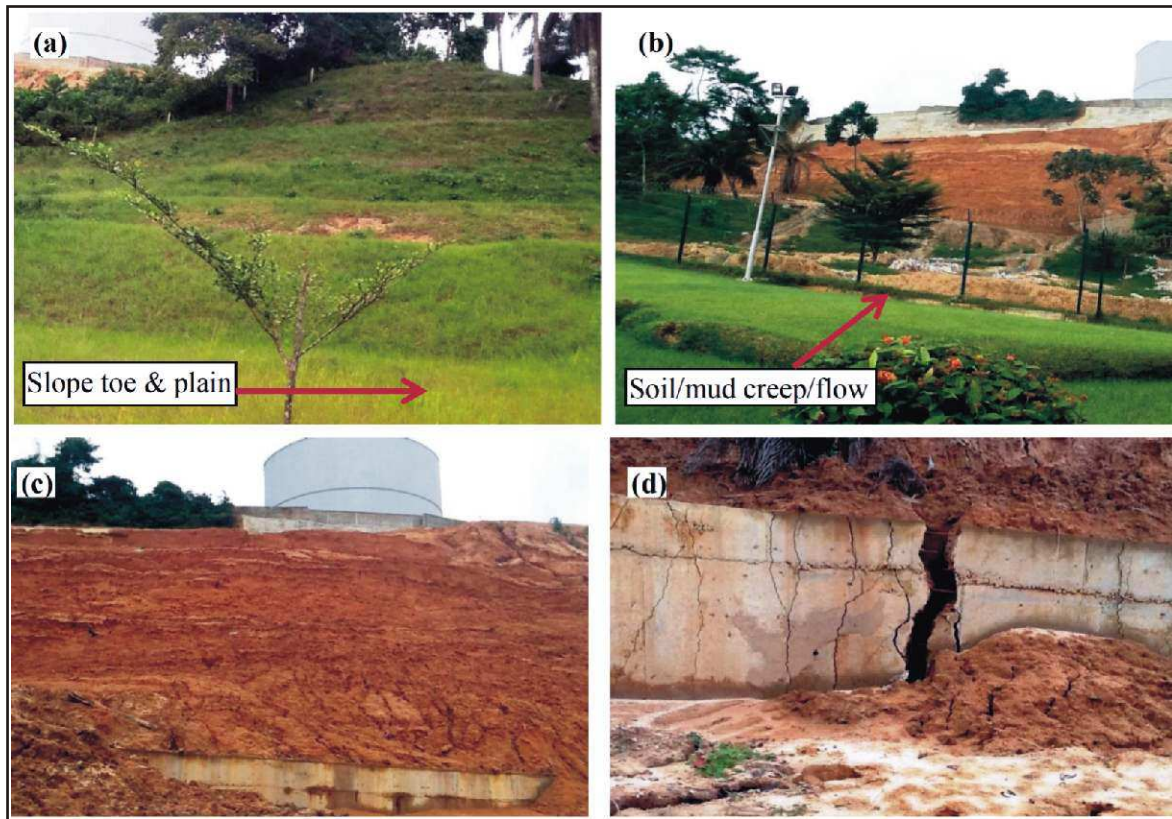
Photographs showing (a) Stable natural and semi landscape river bank slope, (b) Failed section of the natural slope caused by excavation, grading and filling operations during construction of the access road, (c) section of the concrete retaining wall covered by soil slumping from upper slope section, (d) severely cracked and failed retaining wall.
